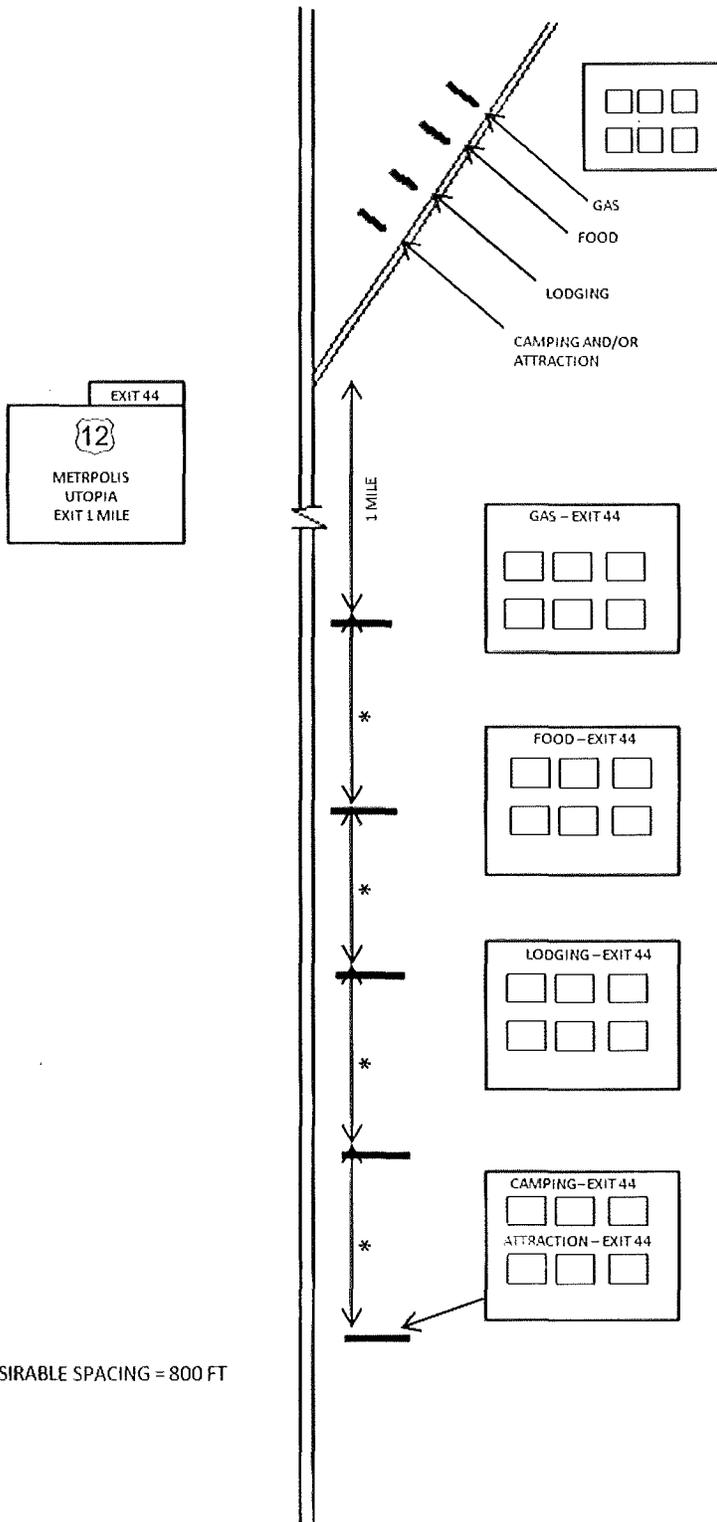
TYPICAL SIGN LOCATION DETAIL
